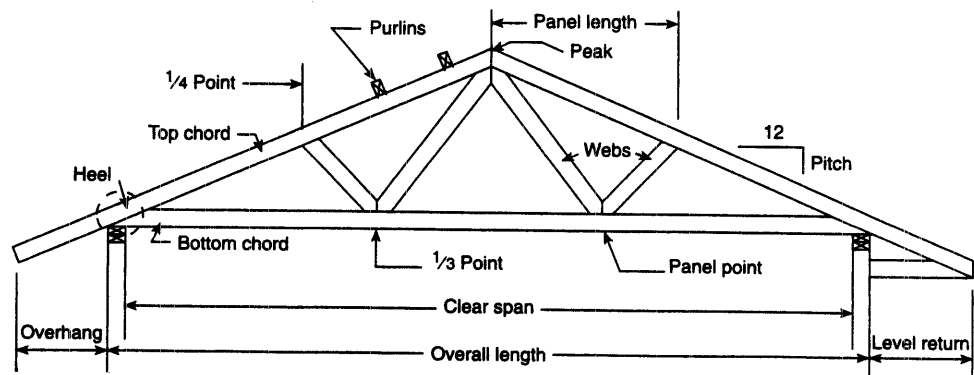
Truss components. (Courtesy of Alpine Engineered Products, Inc.)
